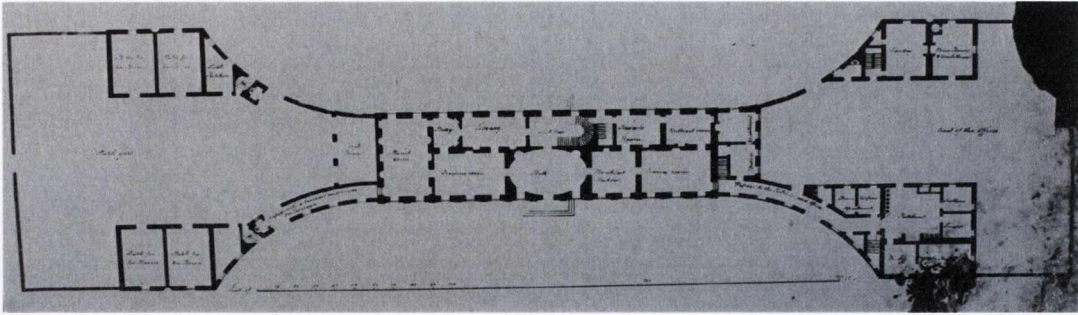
Proposed scheme for Charleville, photograph of ground floor plan, attrib. to James Byres, [1789], IAA, A/4/2, courtesy of the Irish Architectural Archive.
